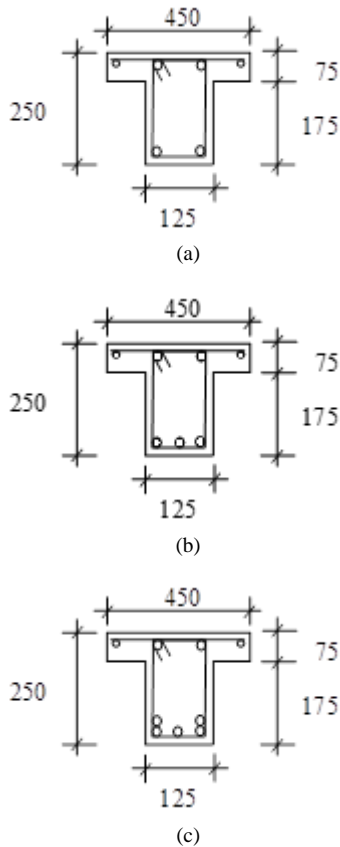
Reinforcement Details of Specimens: a) 2-Y12 top and bottom, 8Y stirrups 2L-150c/c ; b) 2-Y12 top and 3-Y12 bottom, 8Y stirrups 2L-150c/c c) 2-Y12 top and 5-Y12 bottom, 8Y stirrups 2L-150c/c
